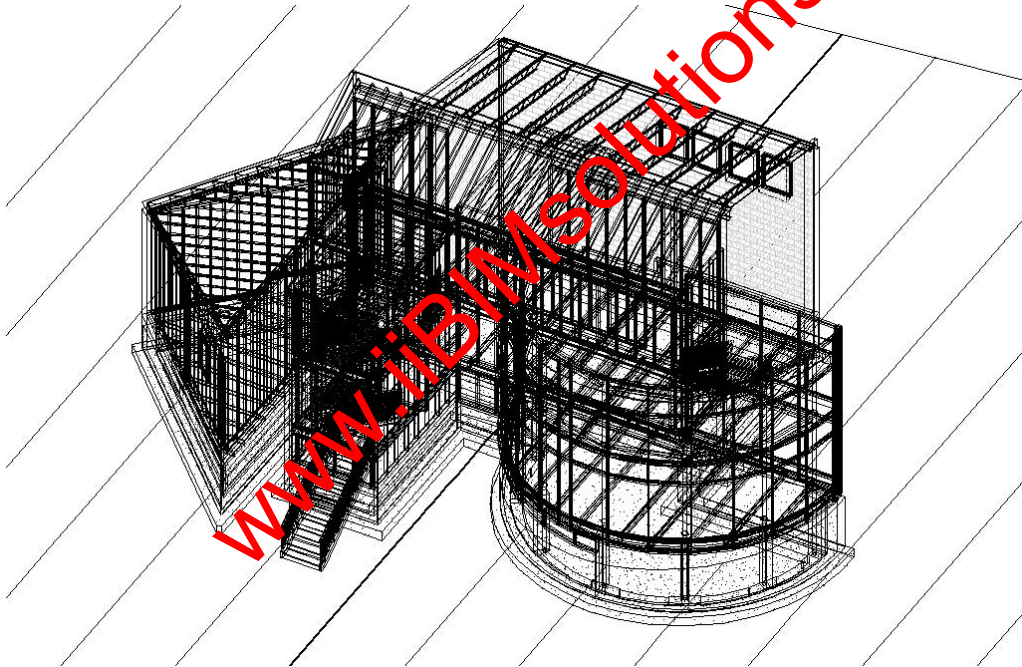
Wireframe axon of Half House component model (courtesy Troy Newell)
